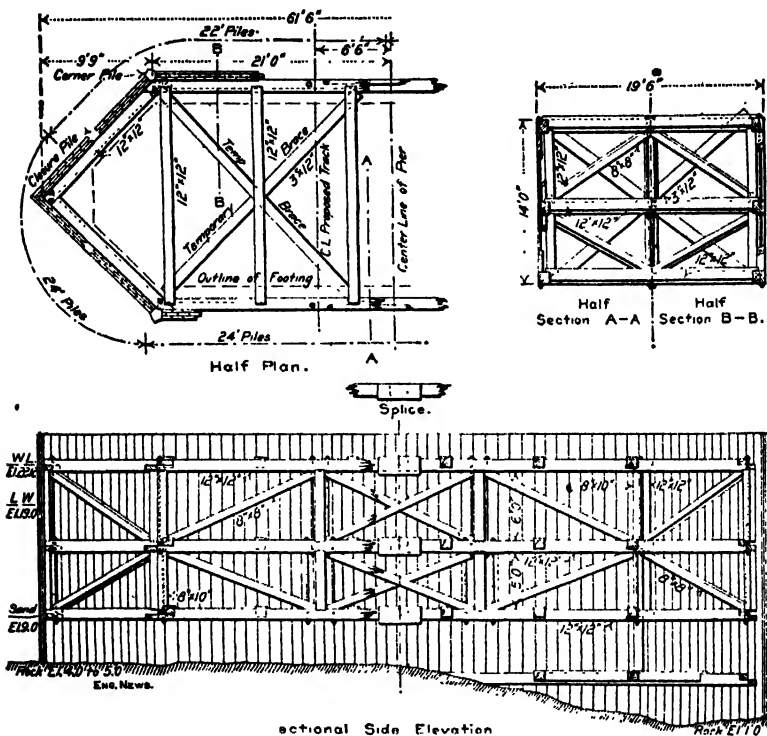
Cofferdam for Pier of Chicago, Milwaukee, and St. Paul Railway, Kilbourn, Wis.
